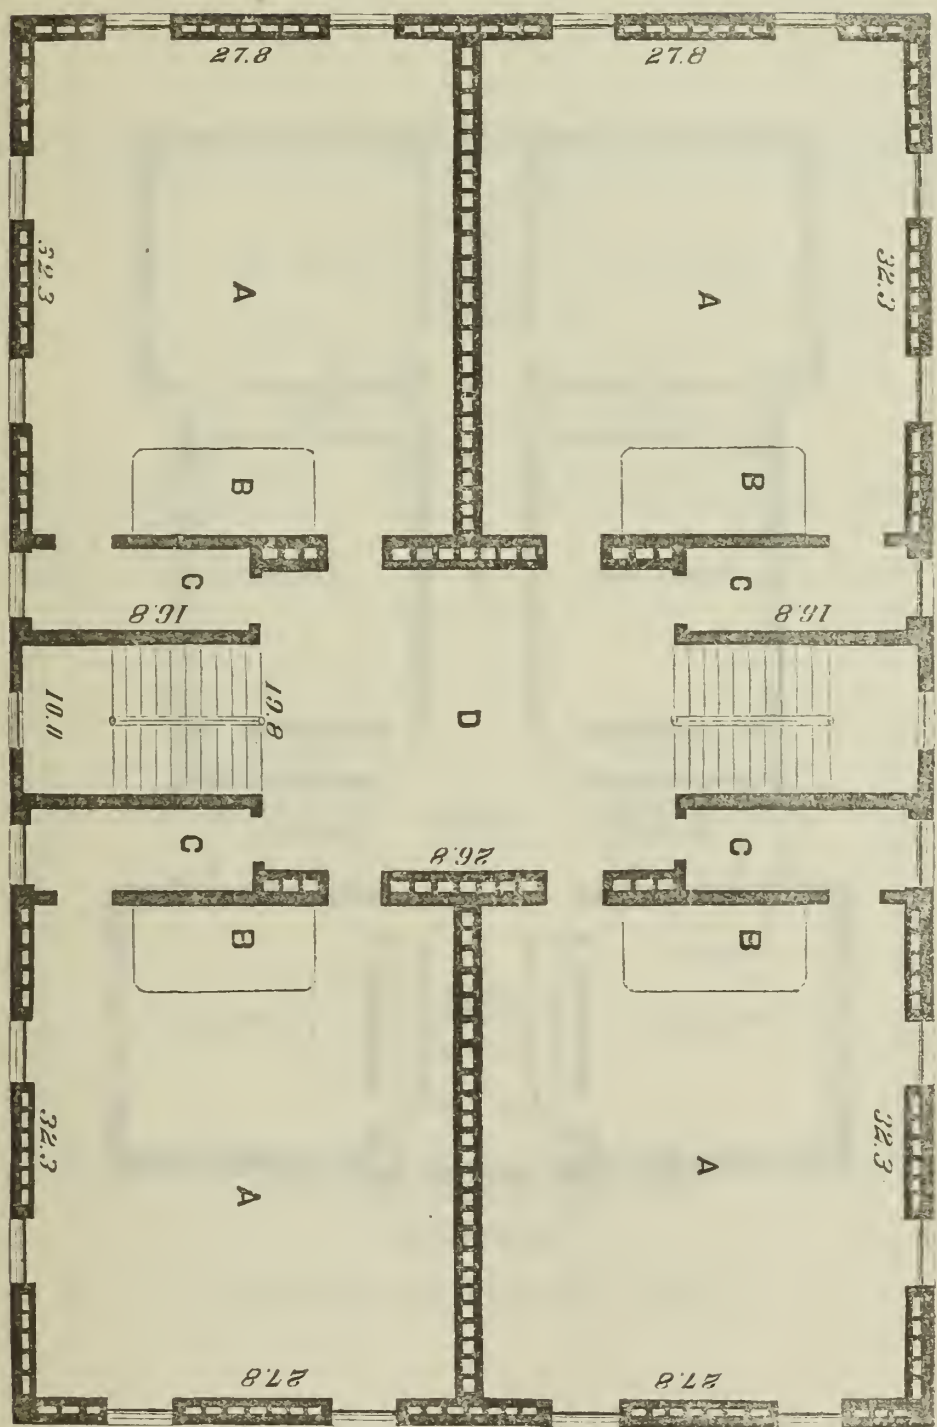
FIRST FLOOR.—DWIGHT SCHOOL-HOUSE.
